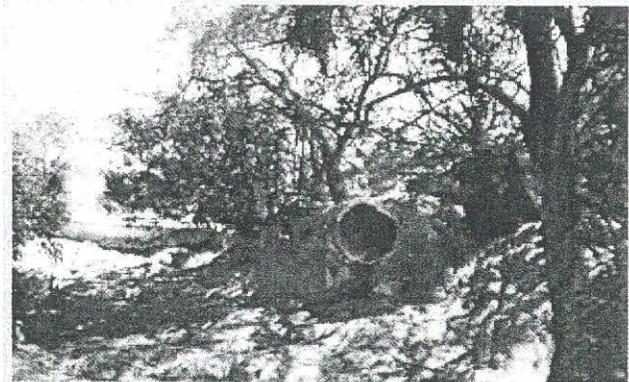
EXAMPLE OF SCOUR AT CULVERT OUTLET DUE TO LACK OF OUTLET PROTECTION
